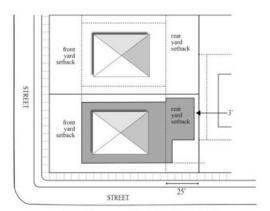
Accessory Building Placement for Reverse Comer Lots, Accessory buildings may be located in shaded areas.
